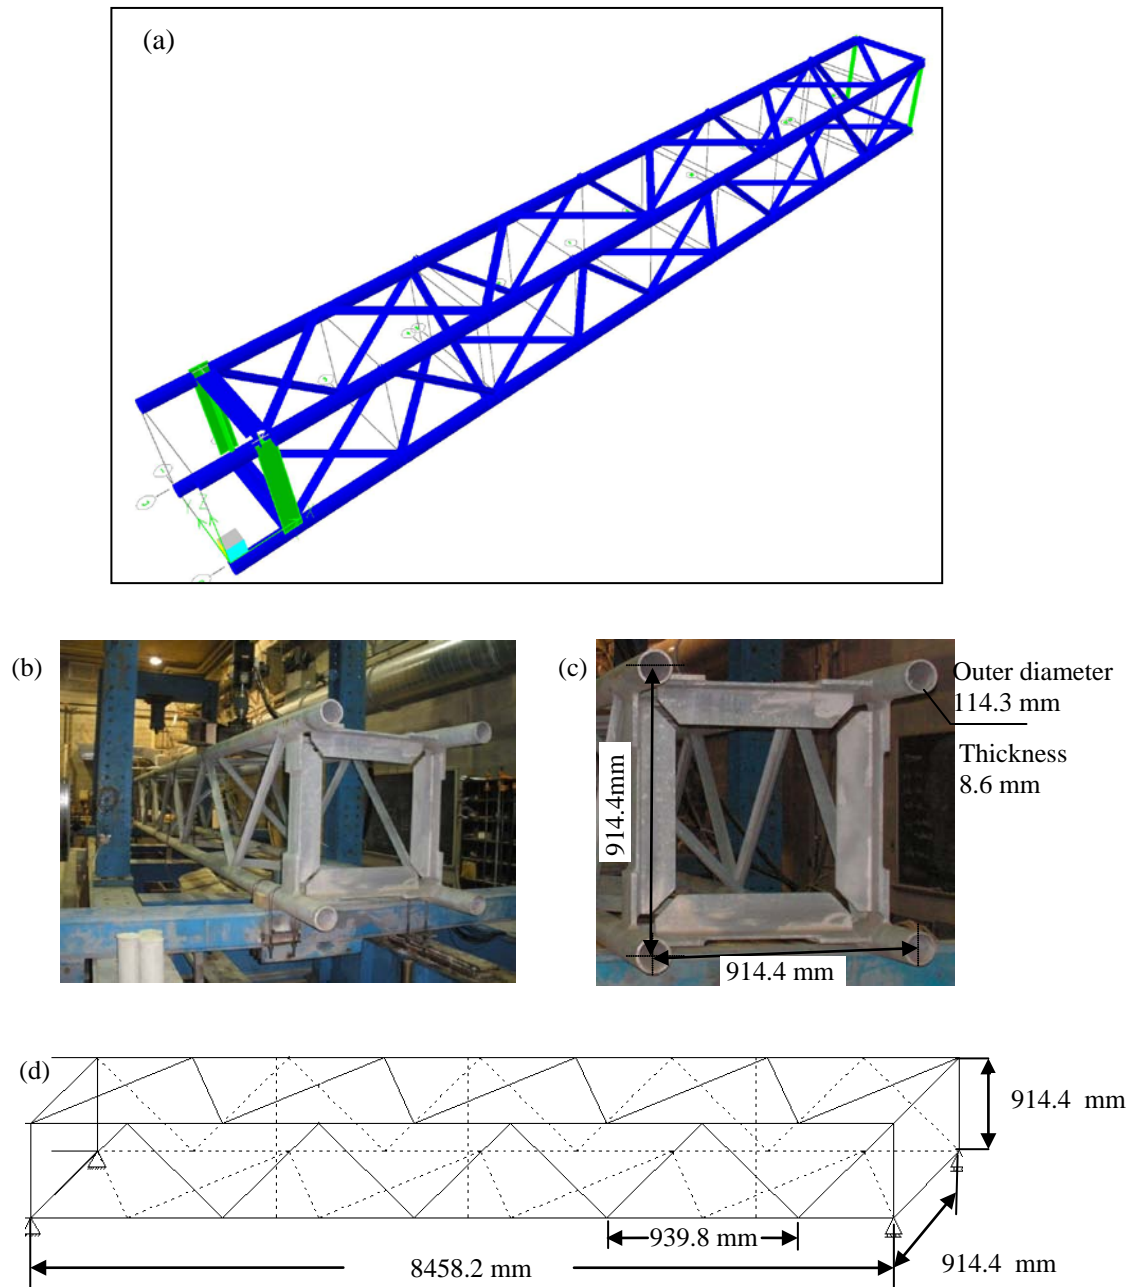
(a) 3-D rendering of the truss. (b-c) Photo of truss set onto the supports
